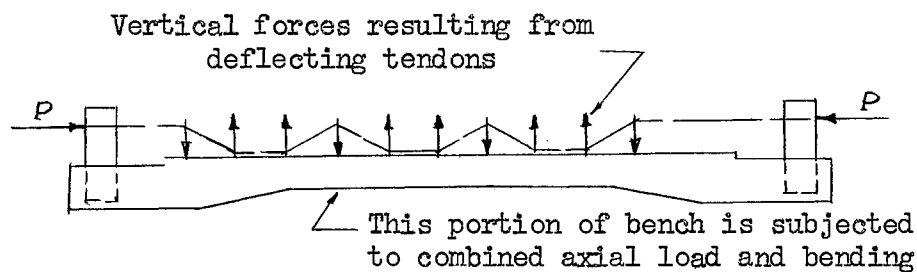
Elevation of Tendon-Deflecting Bench.
